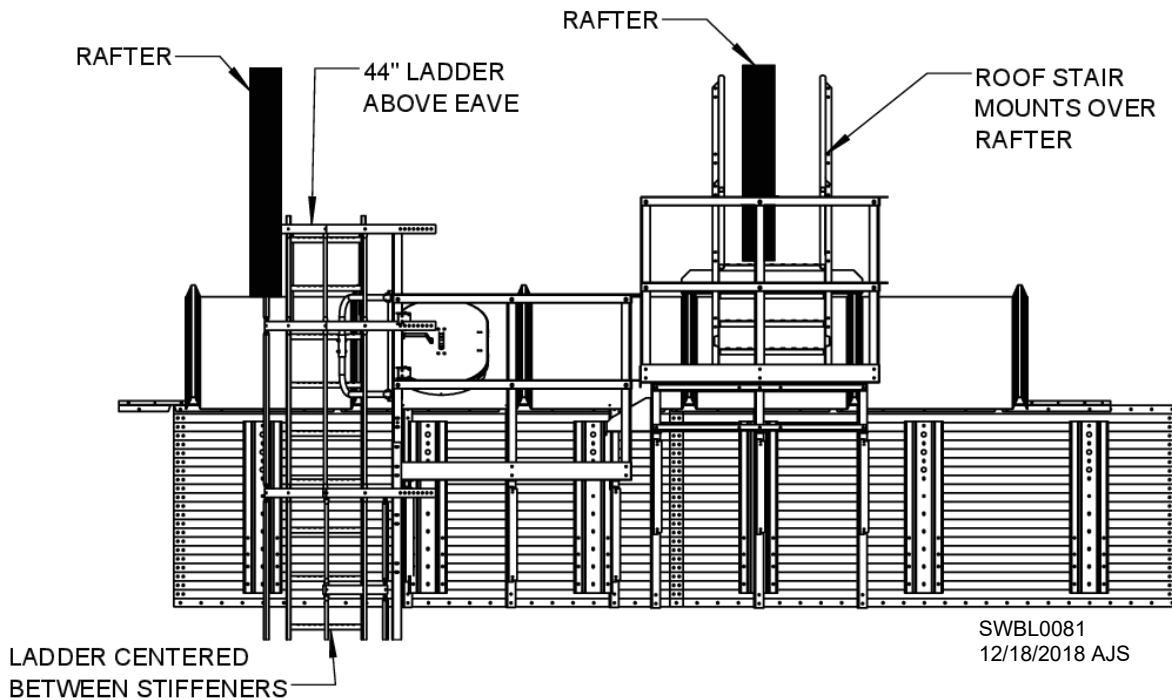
Ladder & platform locations with 3 stiffeners & 3 roof sheets per sidewall sheet
